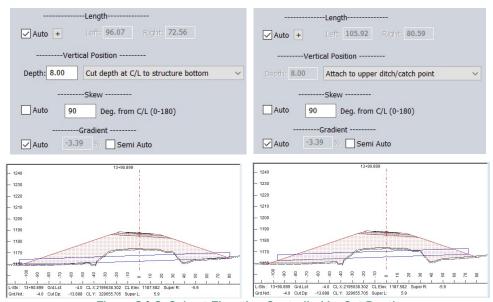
Culvert Elevation Controlled by Cut Depth
